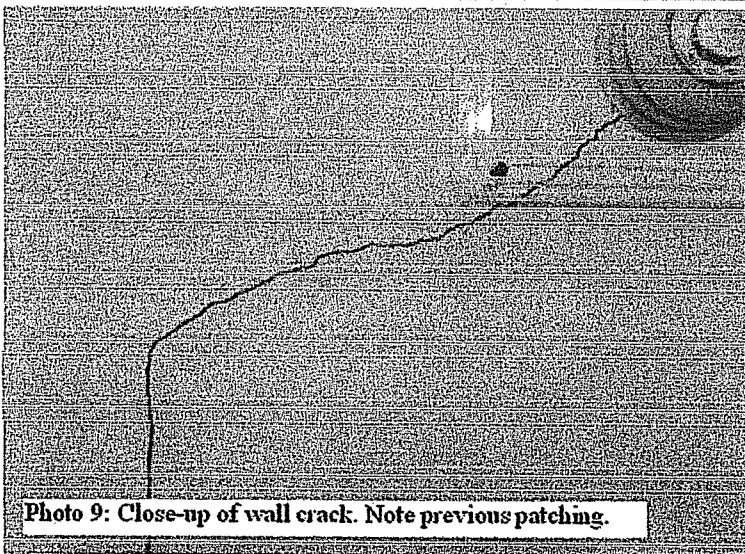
Close-up of wall crack. Note previous patching.
